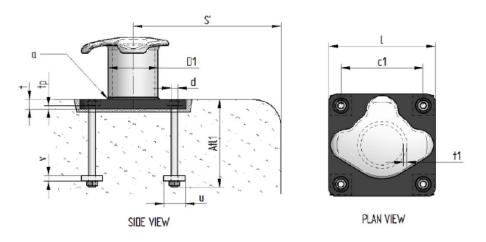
Example of the connection of a bollard to a concrete gravity wall (Havenbedrijf Rotterdam)
